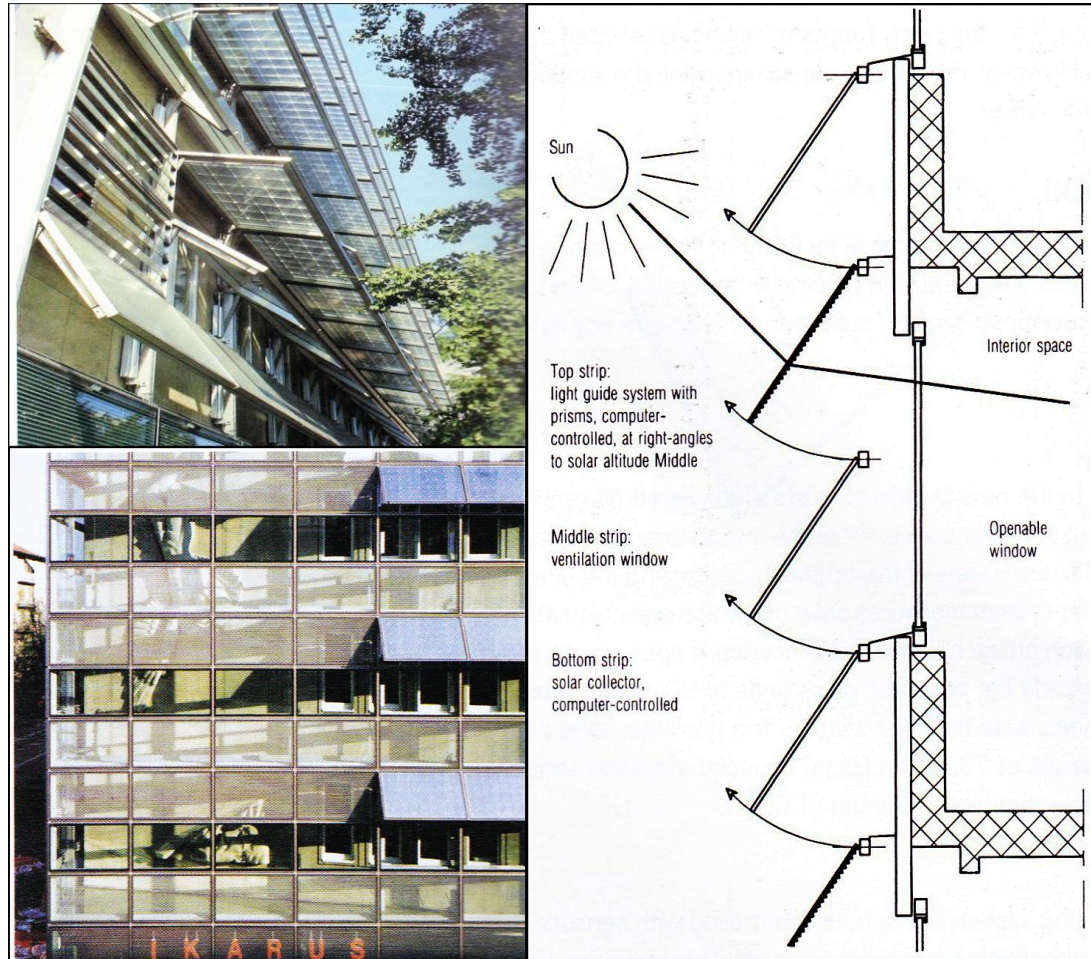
Suva insurance company façade section and use of panels (Wigginton & Harris, 2002).
